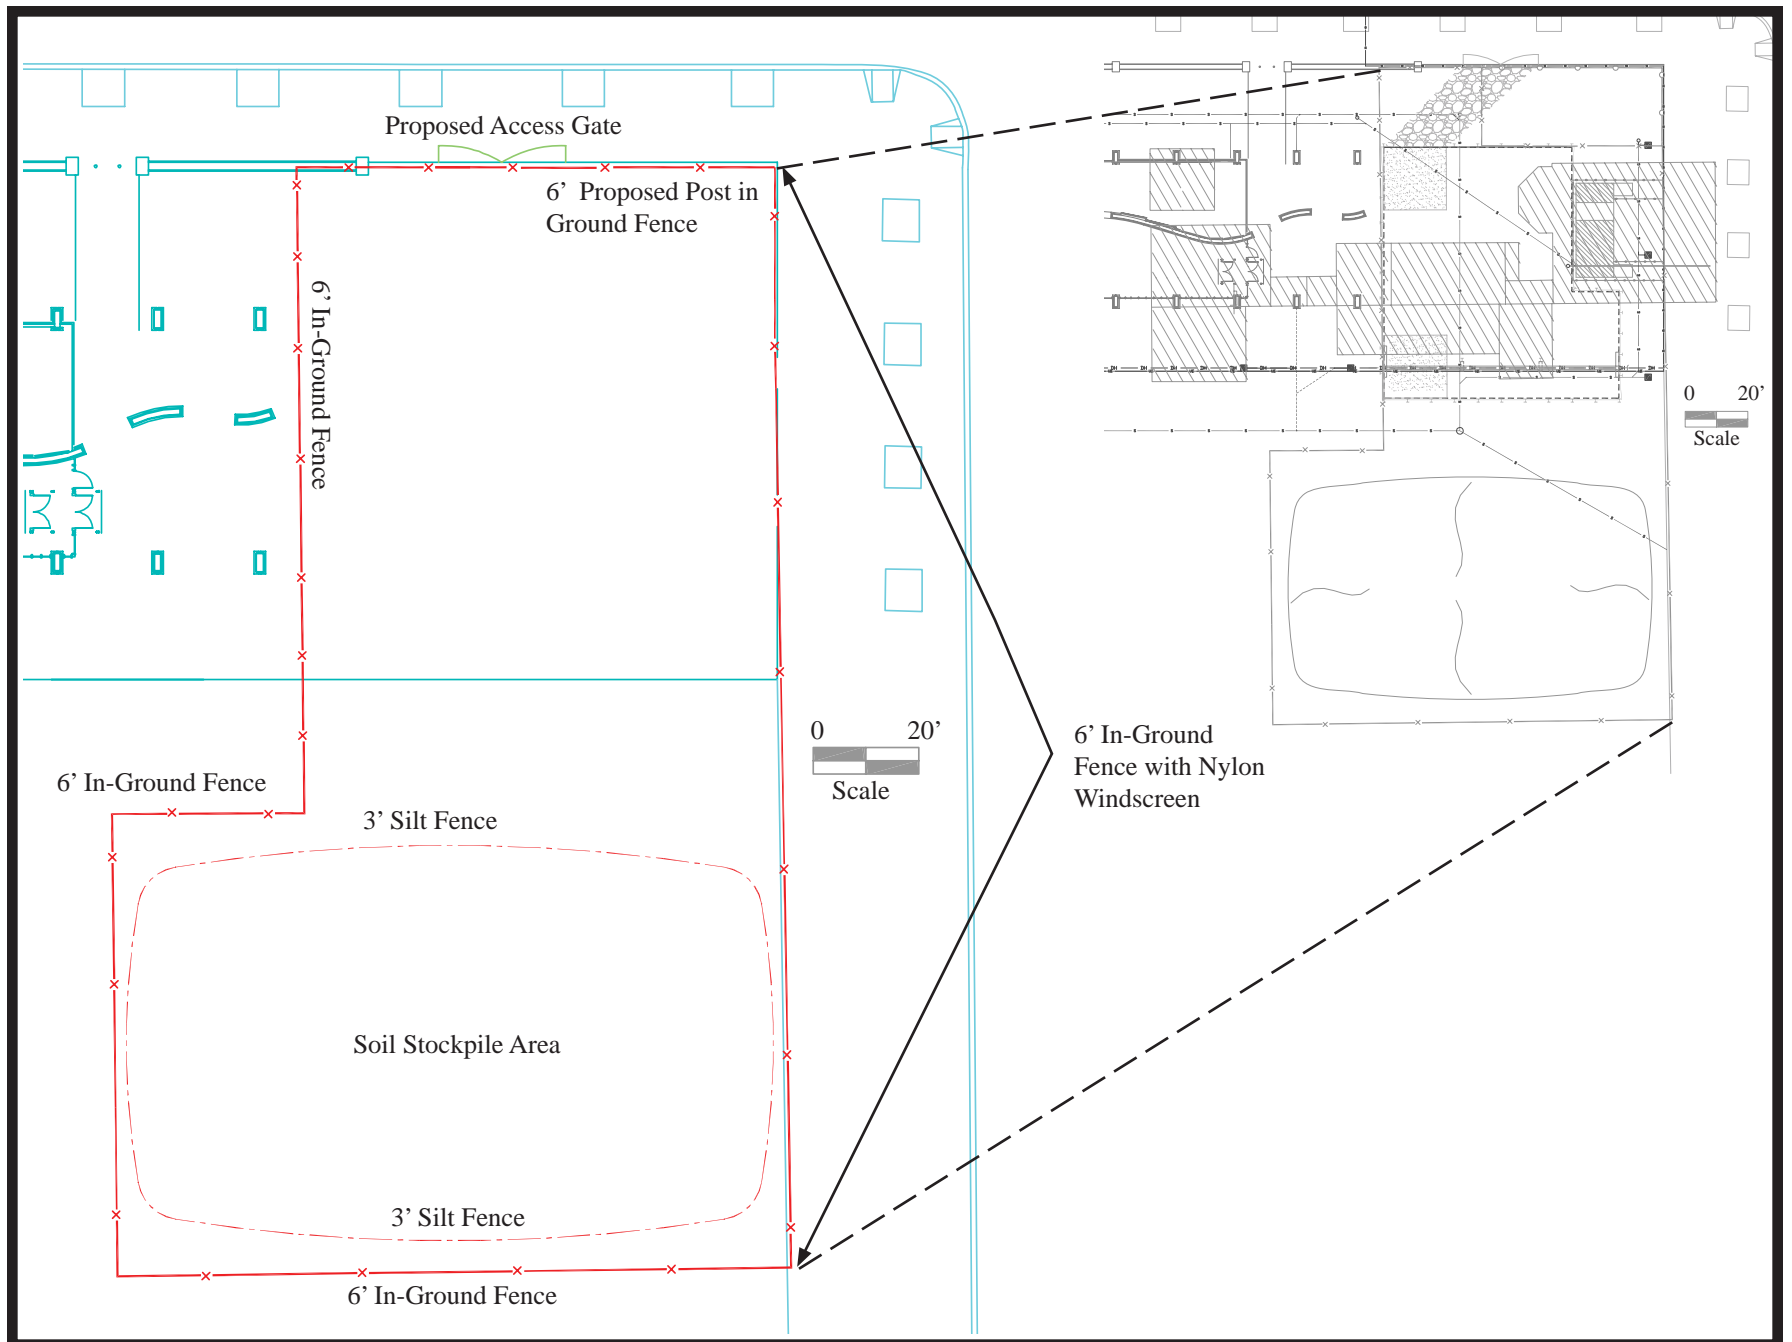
Proposed exterior site fencing and soil stockpile sediment control plan.
